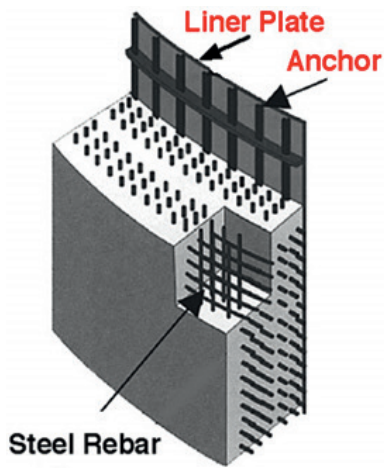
Metallic liner plate adjacent to reinforced concrete.
